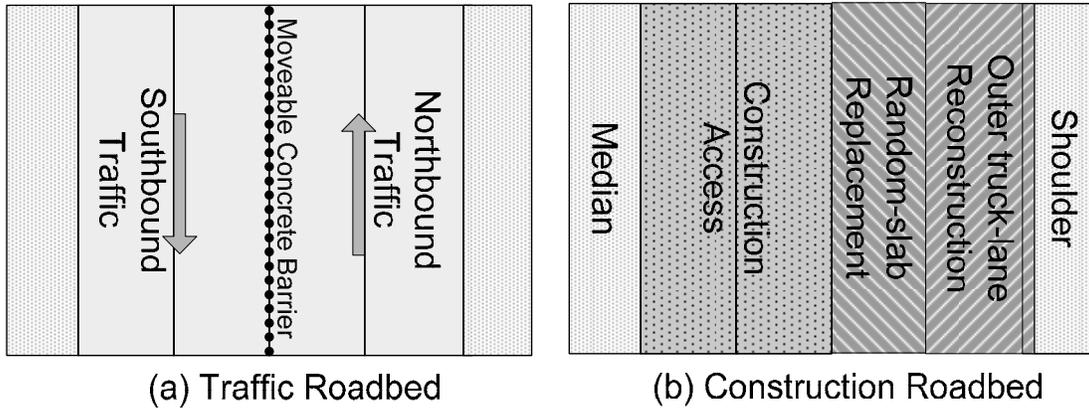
Plan view of the construction and traffic roadbeds in Segment 1
